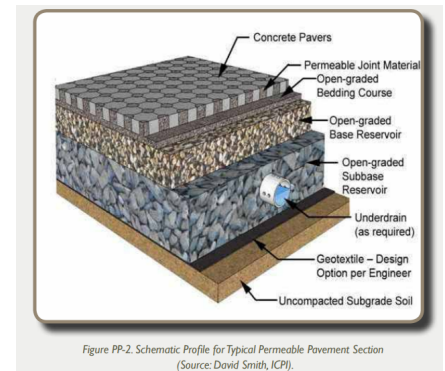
Schematic Profile for Typical Permeable Pavement Section
